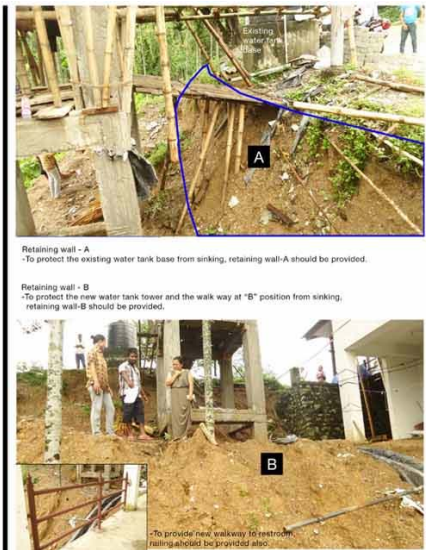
,44. Monitoring reports of Rinchending cafeteria renovation.
